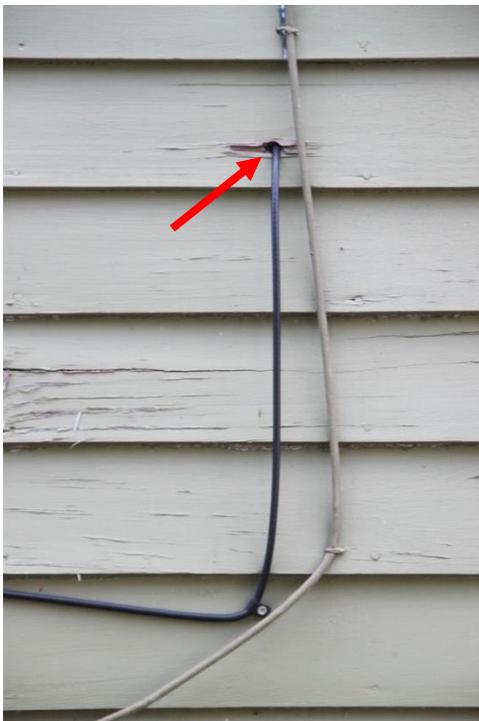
TV and internet cables stapled to the wood siding. Note the damage to the siding where the cable penetrates the exterior envelope, and the penetration is not sealed.
